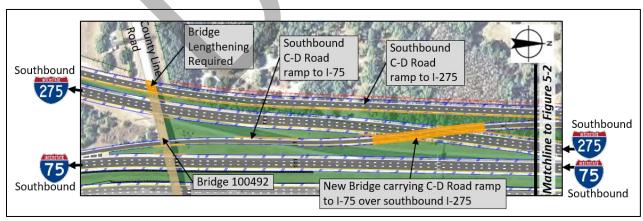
Alternative 1–C-D Road Ramp Bridge over I-275 & County Line Road Bridge
